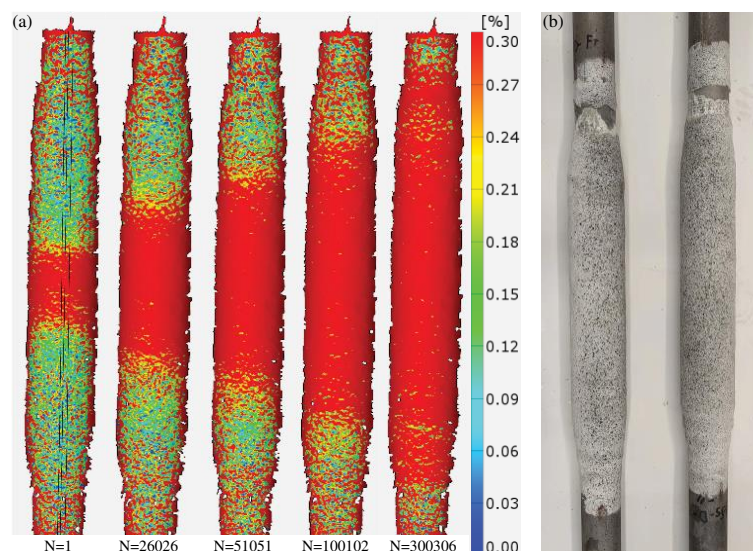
Failure modes of specimens (a) debonding crack propagation under cyclic loading; (b) steel tubes pulled out after static load
